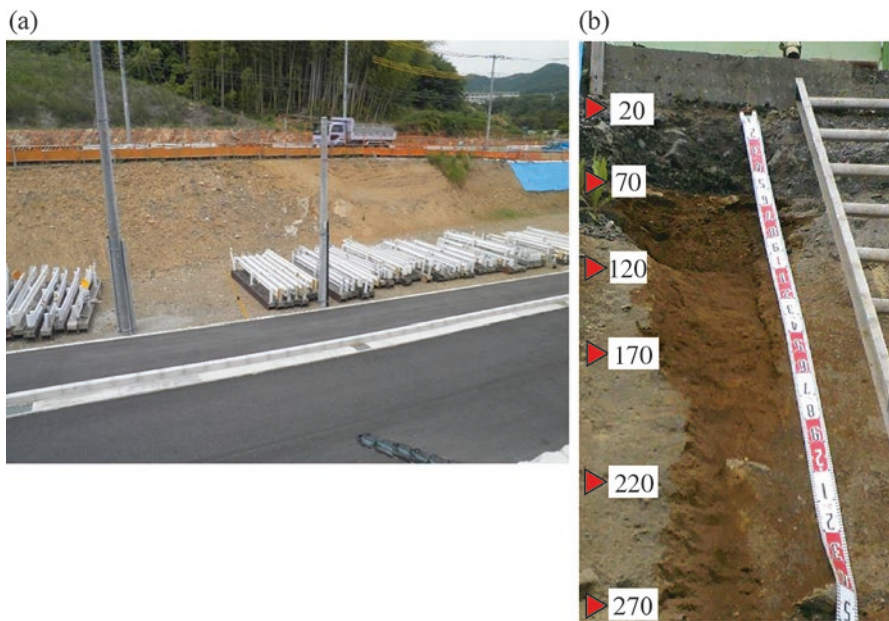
Field photos of the Ogura-town construction site. Photo (a) is an overview of the construction site. The subgrade underneath the original road constructed in 1974 was exposed during construction. The lower part of this photograph shows a newly constructed and paved road. Photo (b) is the soil profile beneath the original road construction. The soil profile was newly exposed by removal of the slope surface. Numbers on white squares indicate the soil depth in cm. The upper number from 0 with a plus sign is the thickness of covered materials
